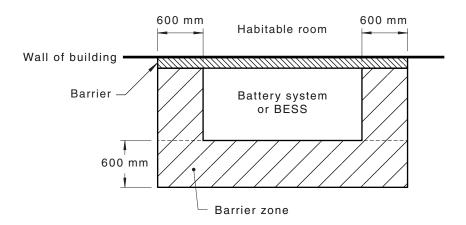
Ground-mounted: plan view of battery system or BESS in accordance with Clauses 4.2.4.2, 5.2.4.2 and 6.2.4.2
